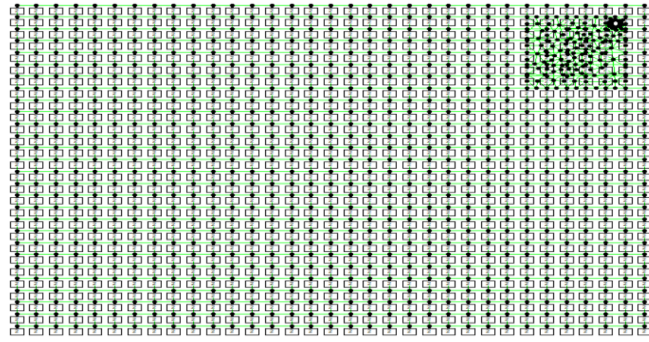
Plan of Model 1 and Model 2 - Rectangular Underground Flood Preventing Water Tank
